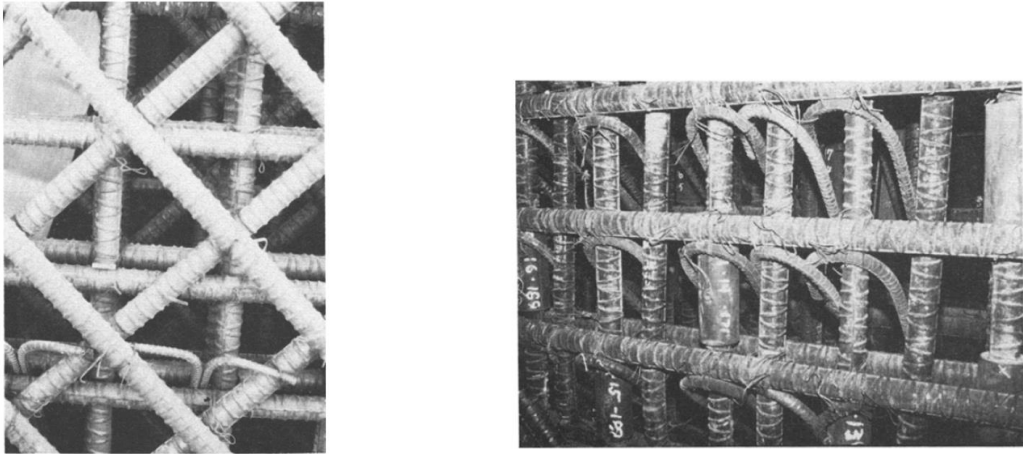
Left: meridional, hoop and diagonal reinforcement. Right: Stirrups (transverse reinforcement) fixed to meridional and hoop reinforcement to absorb radial shear [18].
